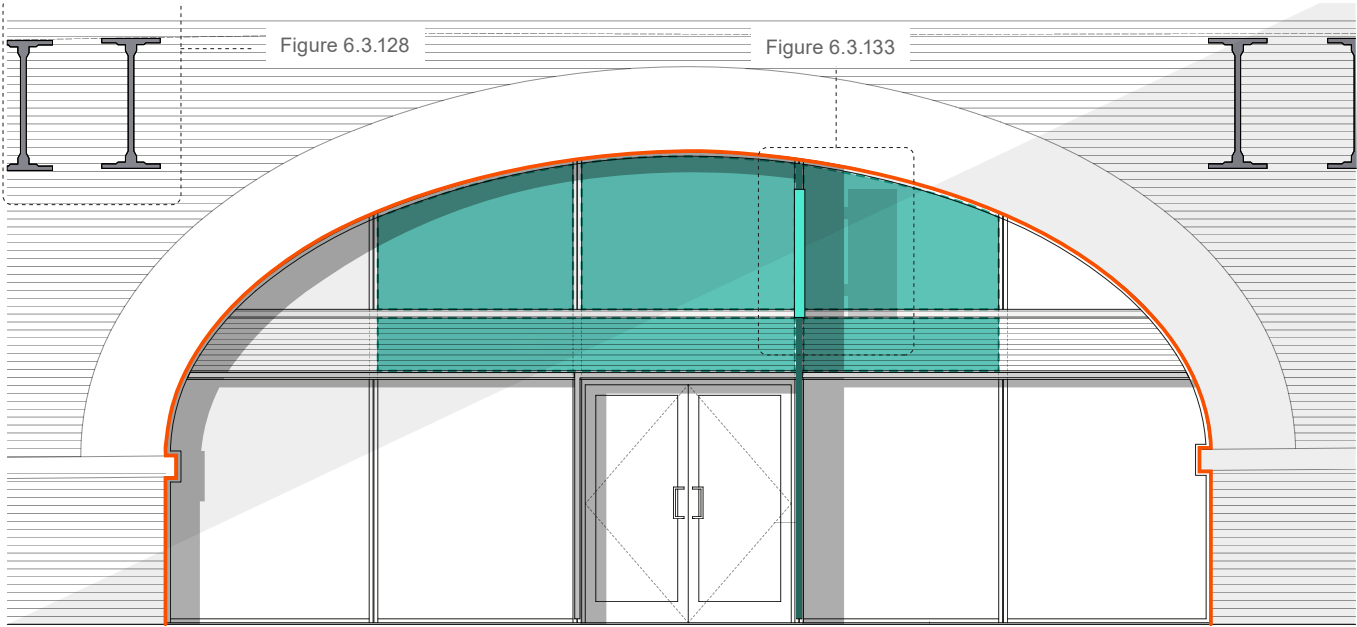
Elevation: Designated signage zone for a typical A1 shopfront
